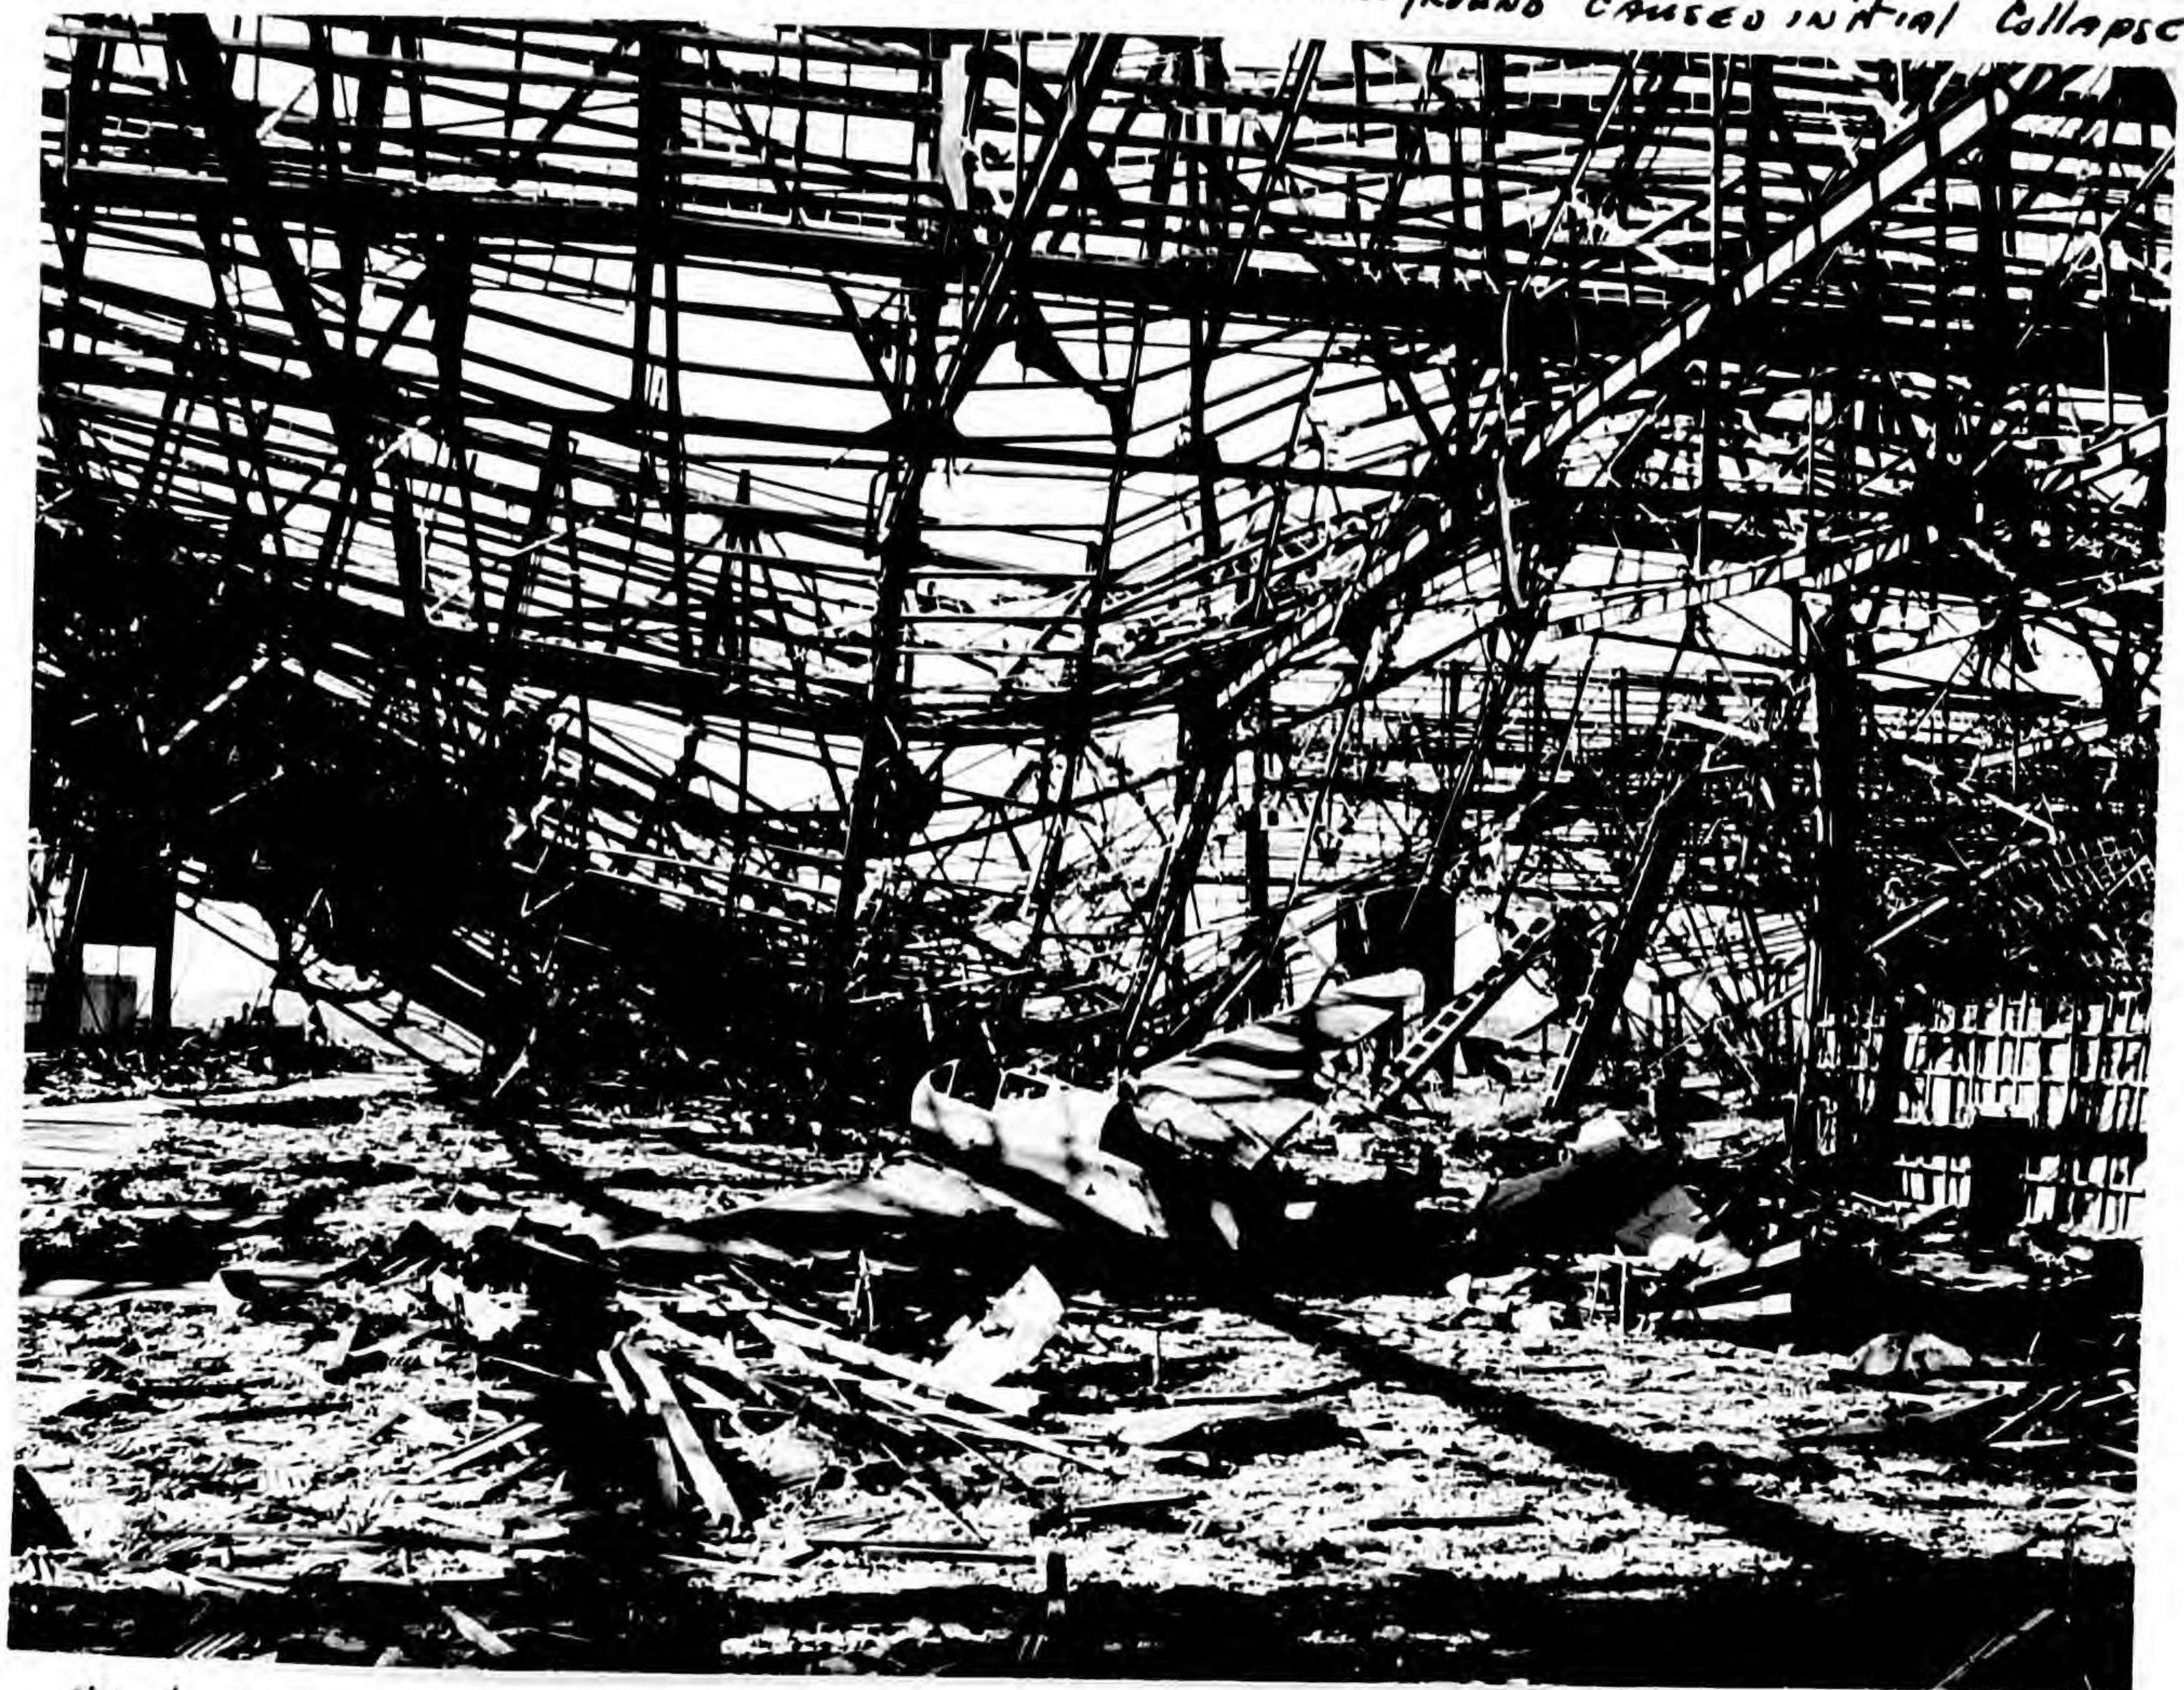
Bldg. 22, Bomb 3, column with arrow caused initial collapse.
